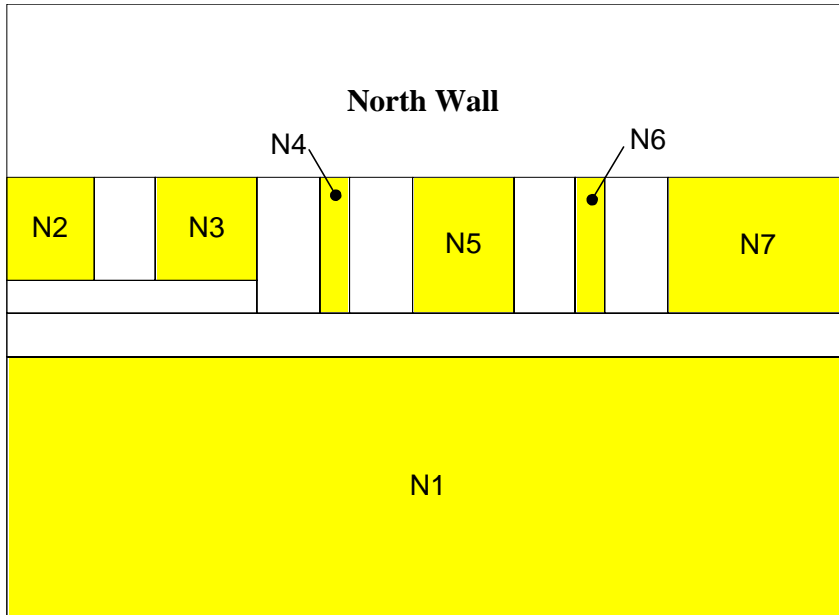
Piers of north wall using the pier-type collapse mechanism.
